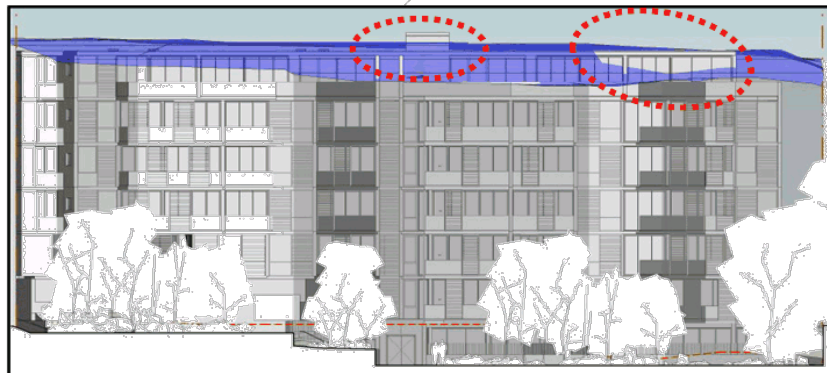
Extract of the building height plane showing the areas of the building that do not comply with the 19m building height control
